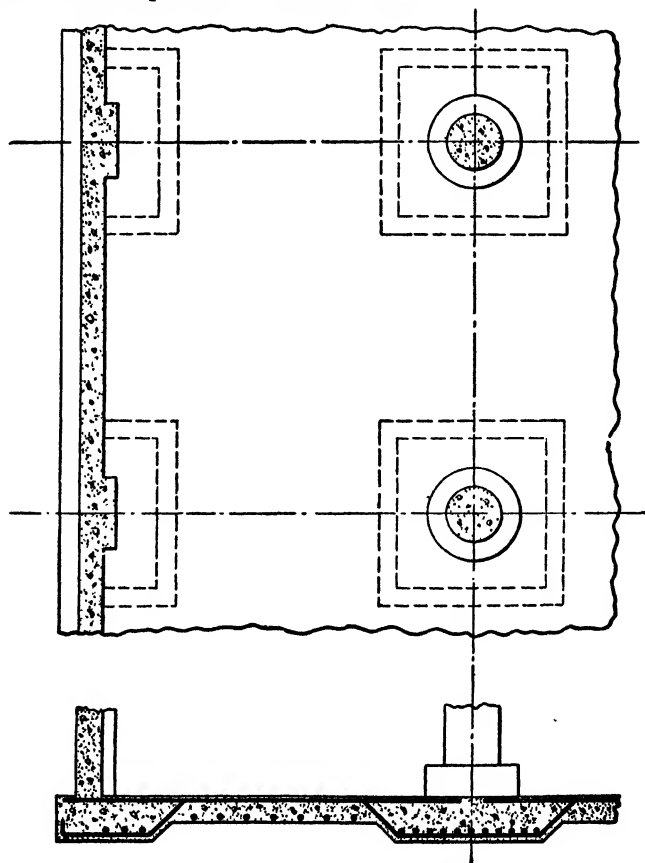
Details of Flat Slab Foundations. (See p. 539.)
